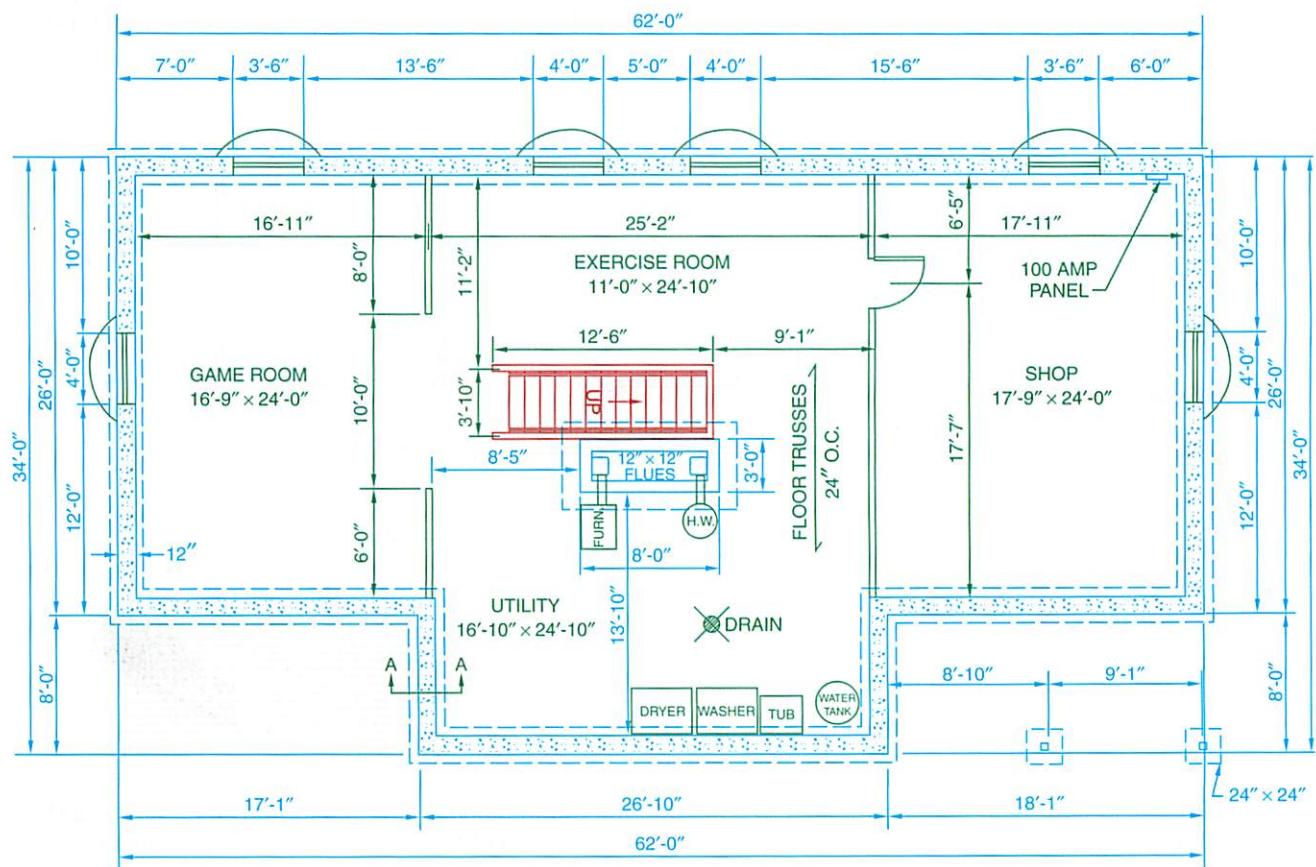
A completed foundation/basement plan drawn with CADD.
